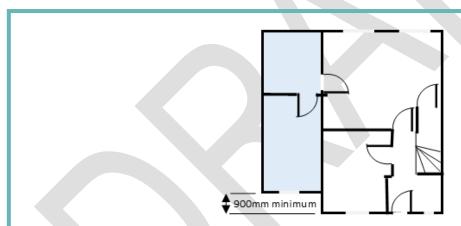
Side extensions should be set back at least 900mm from the front main wall of the house to ensure subservience.
